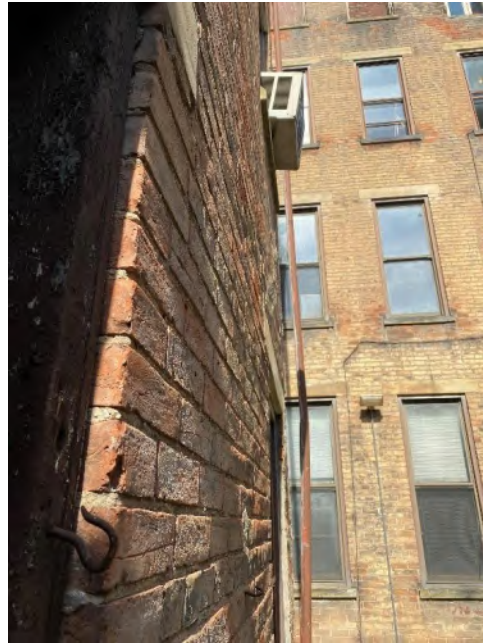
Rear Exterior Where Building Meets 2016 Ohio Ave
